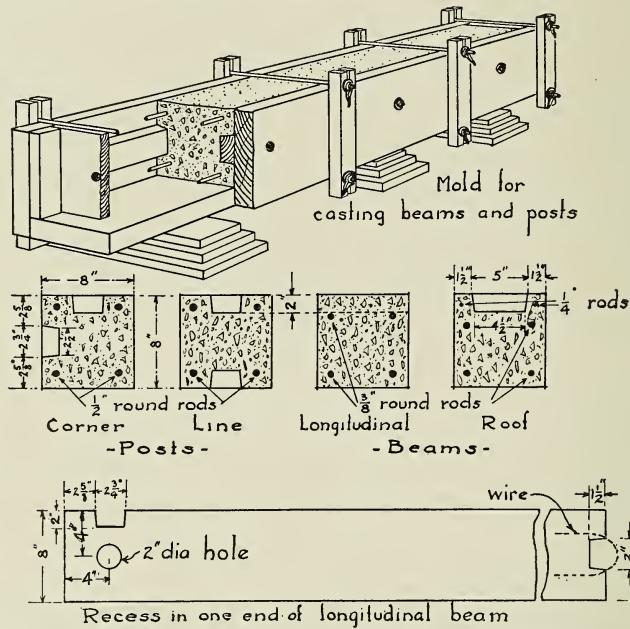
Post and Beam Mold, cross sectional views of posts and beams for slab shelter house, and plan of a longitudinal beam.
